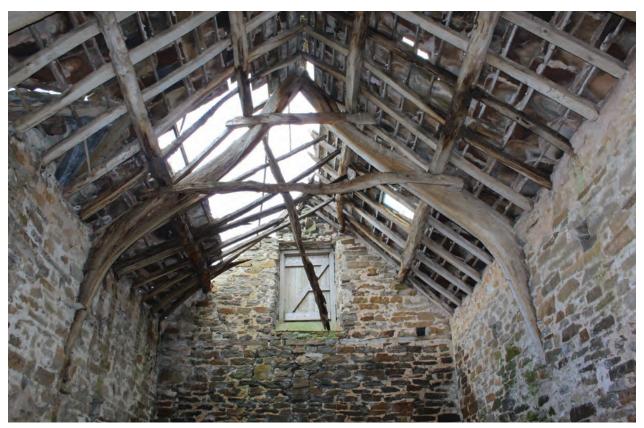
Detail of northern section of roof structure in Room G2, facing north. No scale
